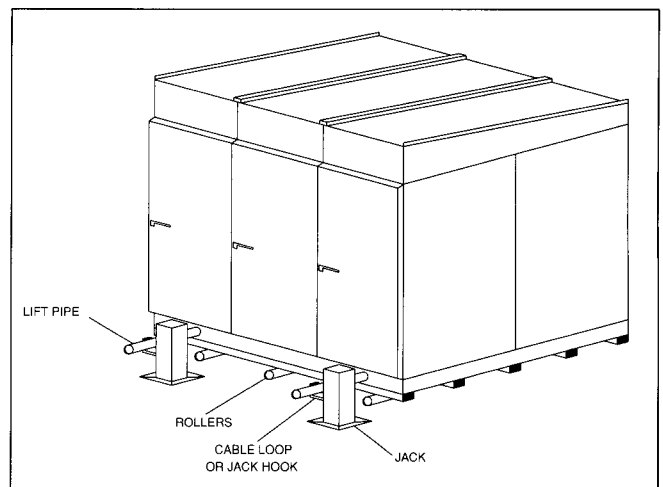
Moving Outdoor Switchgear with Jacks and Rollers
